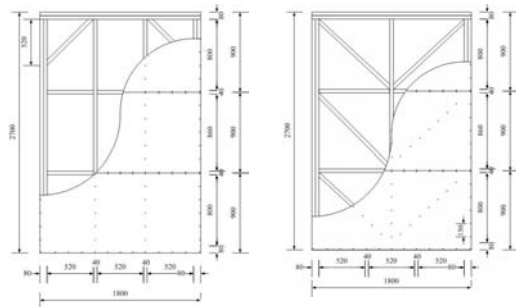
Conventional shear wall frame (SWC) and Braced Shear wall frame (SWB) specimens.
